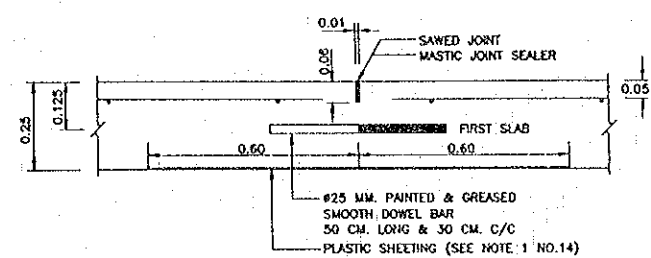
DETAIL OF BROOM SURFACE CONCRETE PAVEMENT
